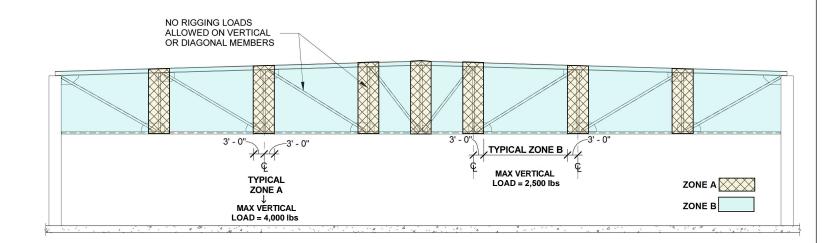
EXHIBIT HALL RIGGING PLAN NOT TO SCALE
